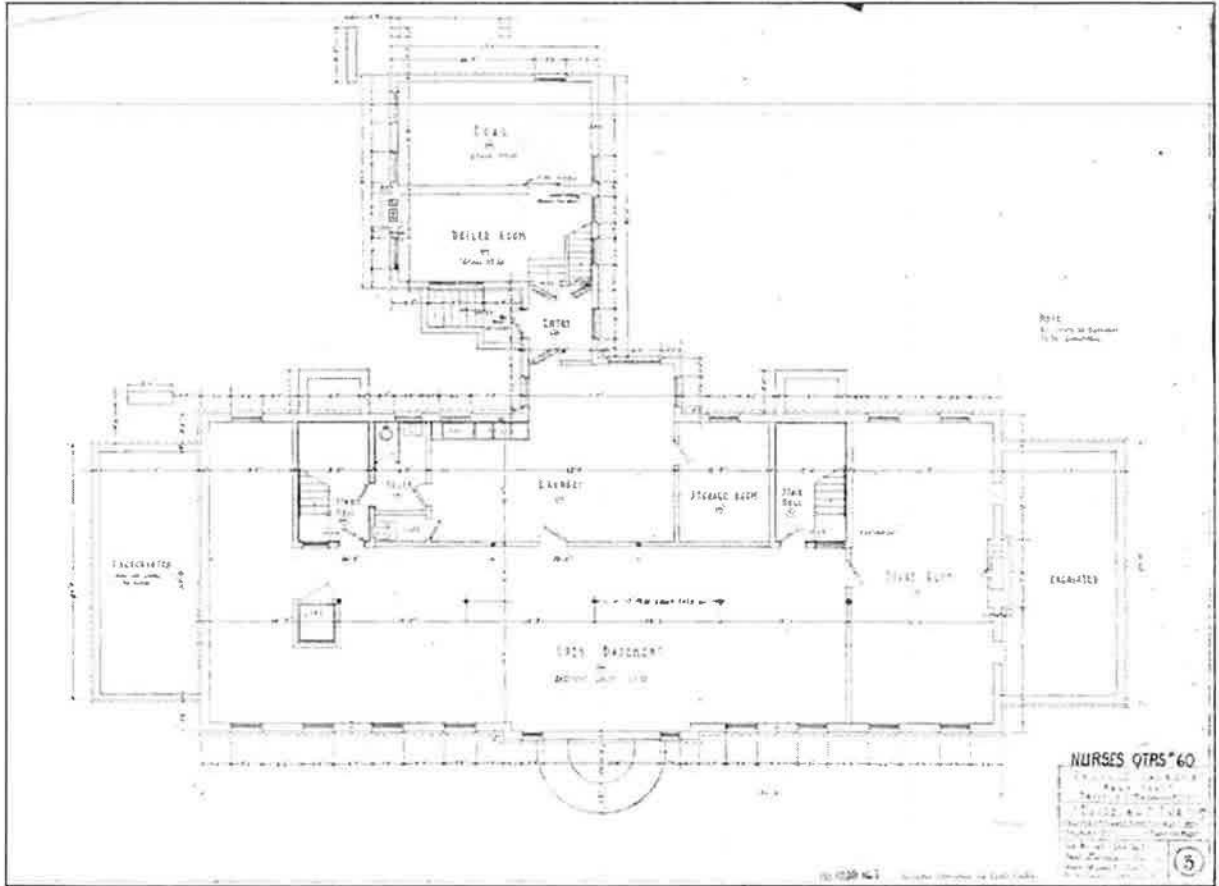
Howard Home for Aged Men original basement floor plan (Ralph P. Jackson, 1924).
